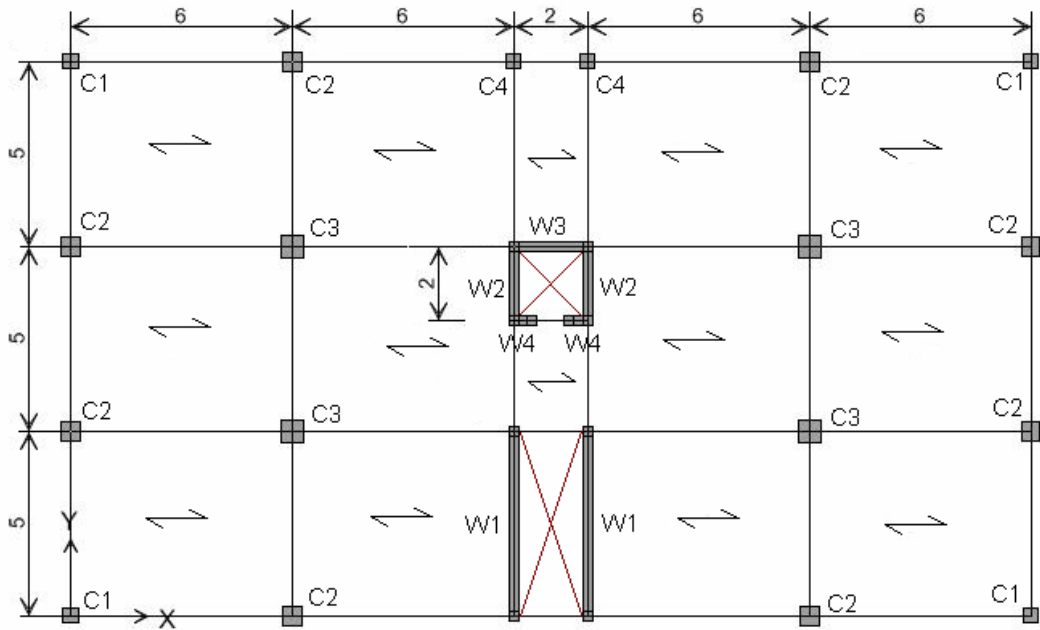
Plan layout for Model # 4 (F3URC)
